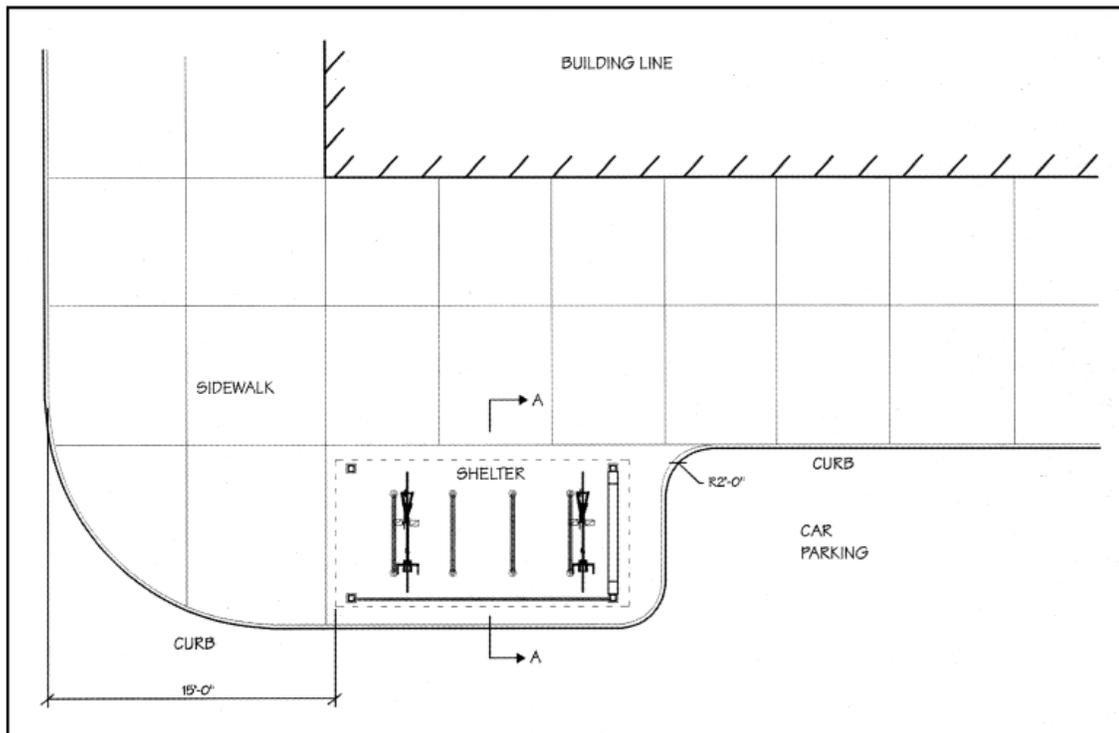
Plan of Proposed End-Block Curb Extension with Sheltered Bicycle Parking
